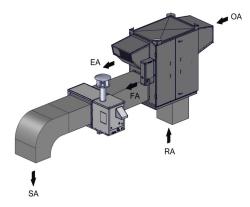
TYPICAL INSTALLATION OF OUTDOOR TOP EXHAUST FURNACE
